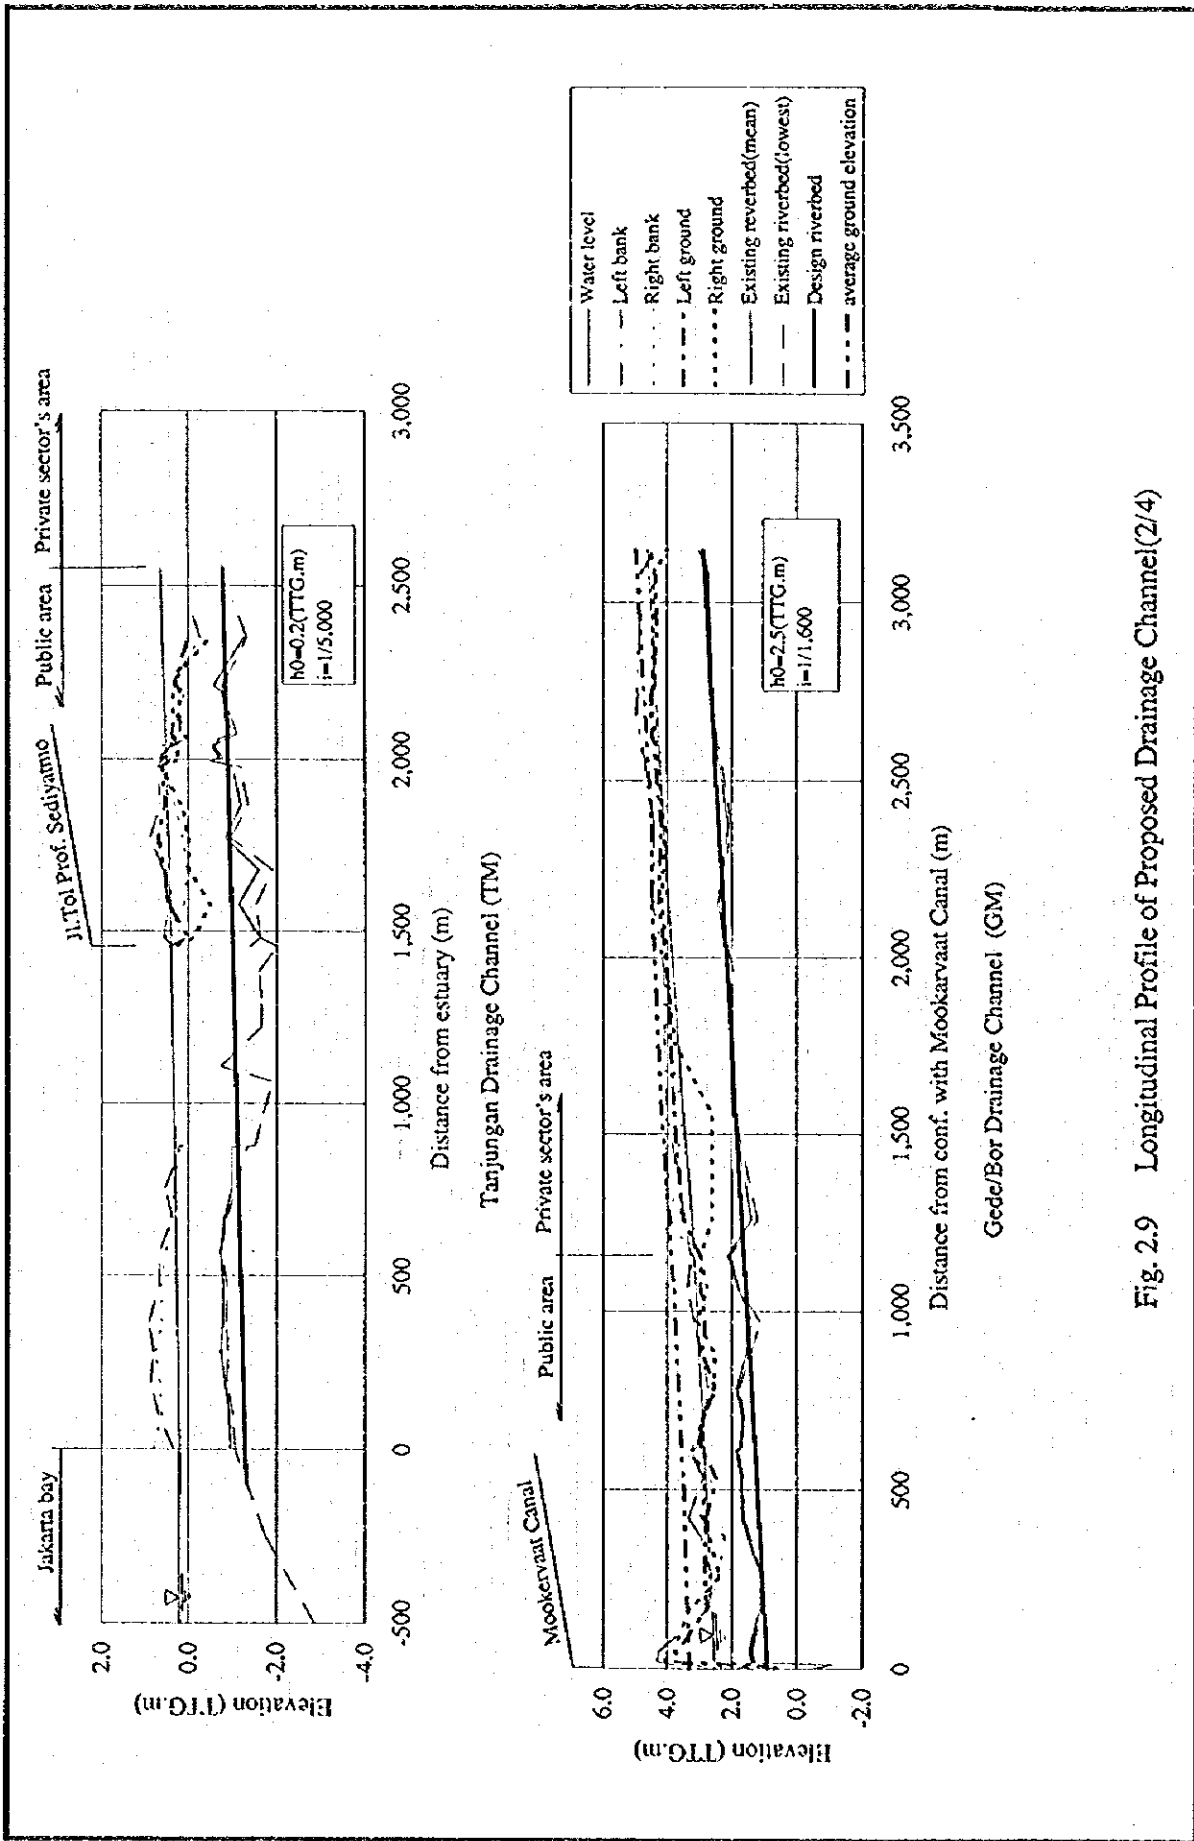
Longitudinal Profile of Proposed Drainage Channel(2/4)
